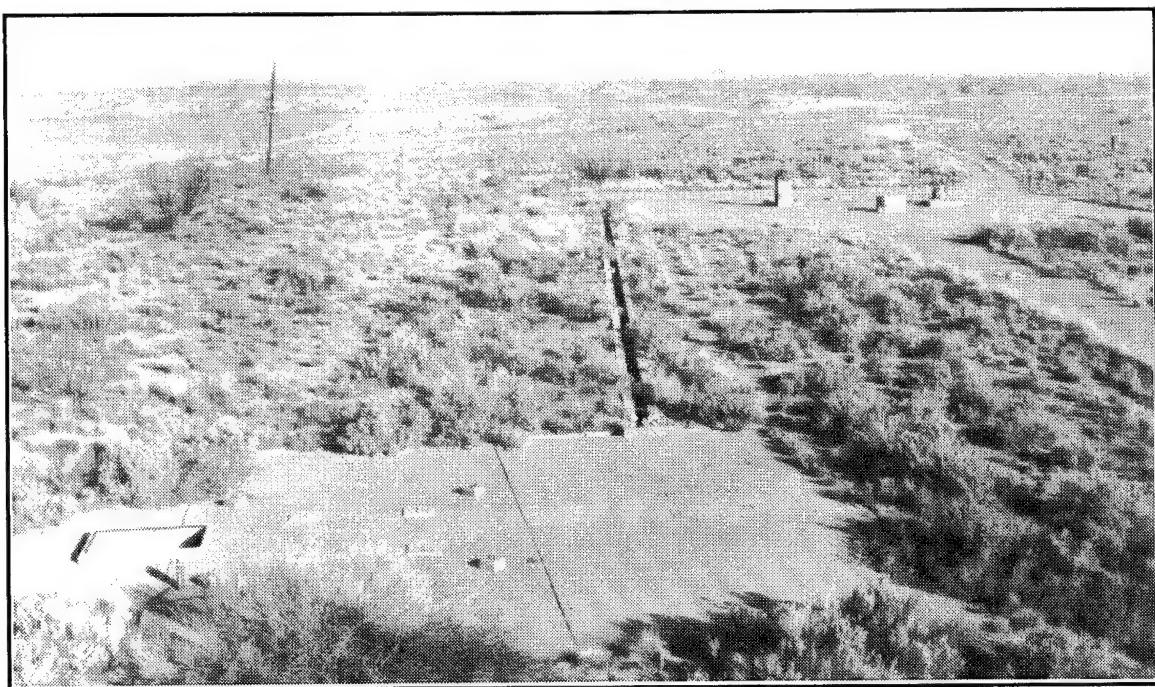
NATIV static test pad (foreground) and firing apron connected by a cable trench, looking north from the observation shelter (Mertens/HAFB 1995).
